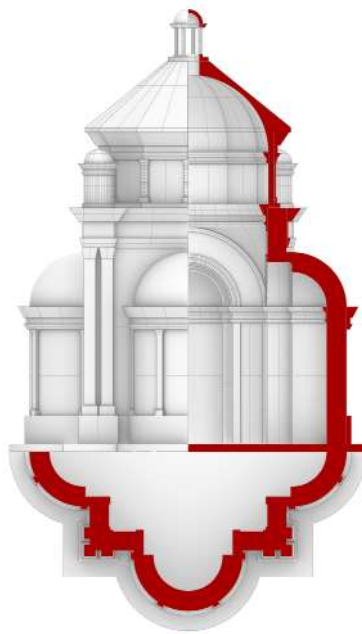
Plan, section and elevation (1:500) of the solution with a cloister dome and an exterior dodecagonal drum.
